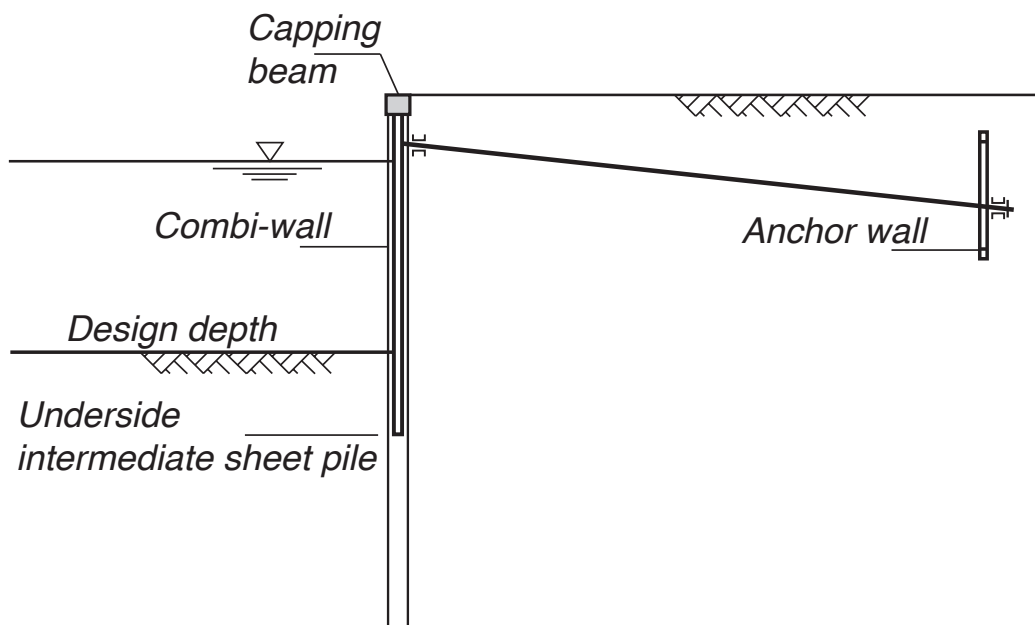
Main cross-section of quay wall in Project 1 (SBRCURnet, 2013)
